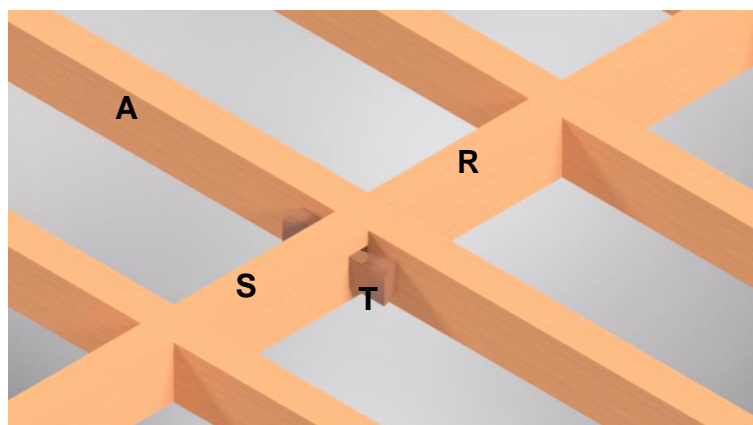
Tarugo – Lateral movement block of pavement beams – Schematic representation – A – Pavement Beam; R – Tarugo; S – Tarugo de chaveta; T – Palmeta or wood chocks
